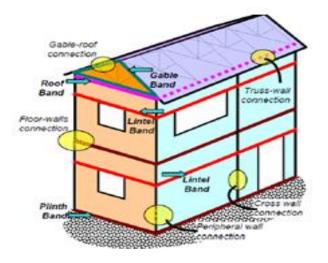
Horizontal Bands In masonry Building (Two storey with pitched roof)
